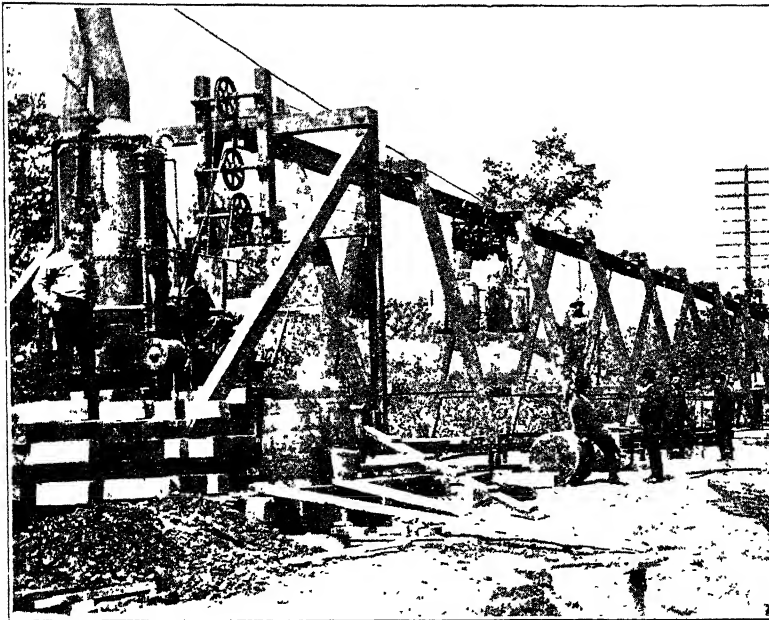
Trestle Cable Excavator on Sewer Trench Construction
